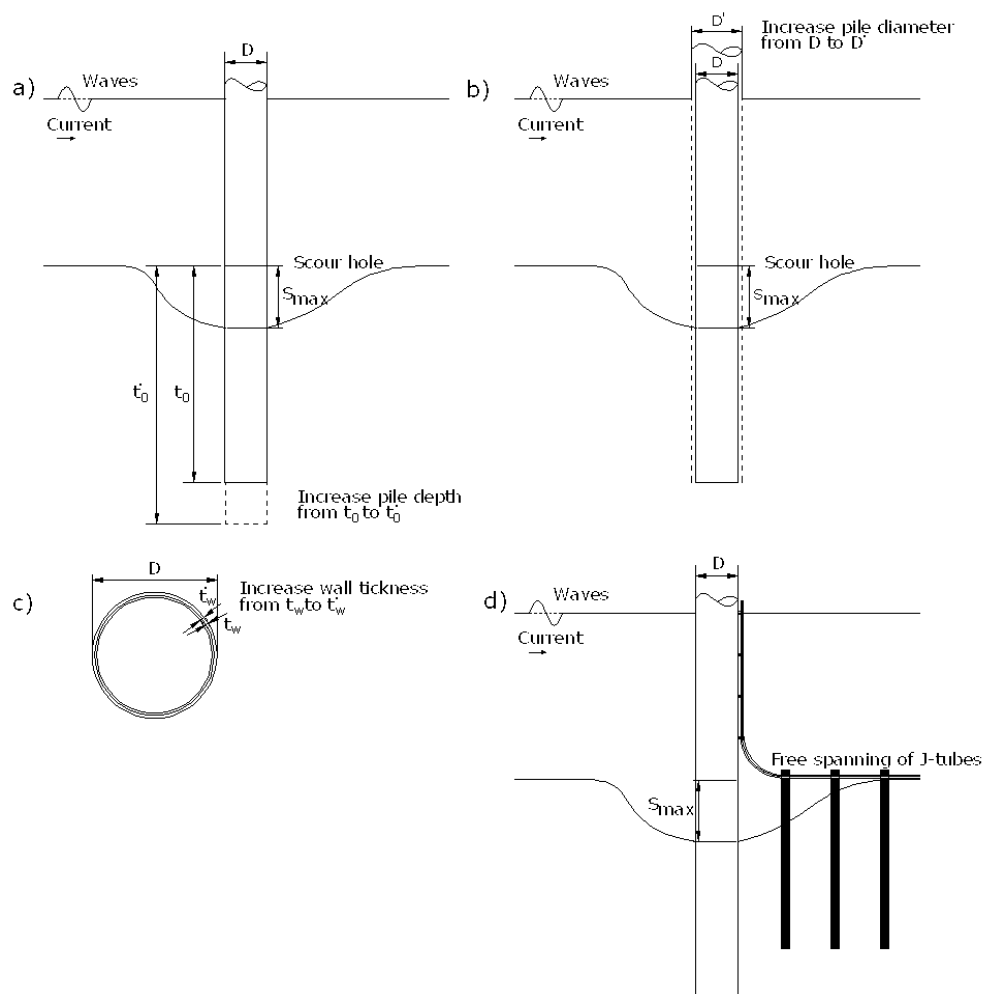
possible alternative for a scour protection around a monopile foundation: allowing local scour to develop
